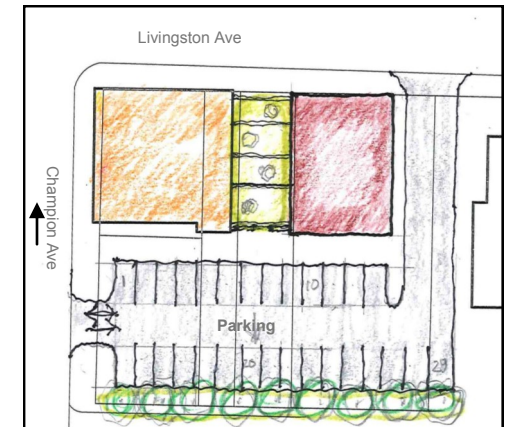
Site plan for the southeast corner of Champion and Livingston illustrating the parking located to the rear of the building.
